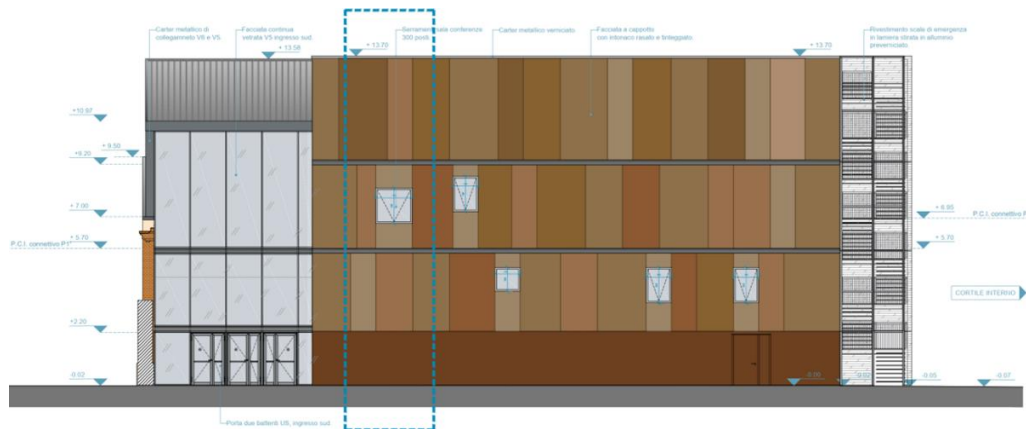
Architectural prospect of the south-east oriented façade of the classroom building
